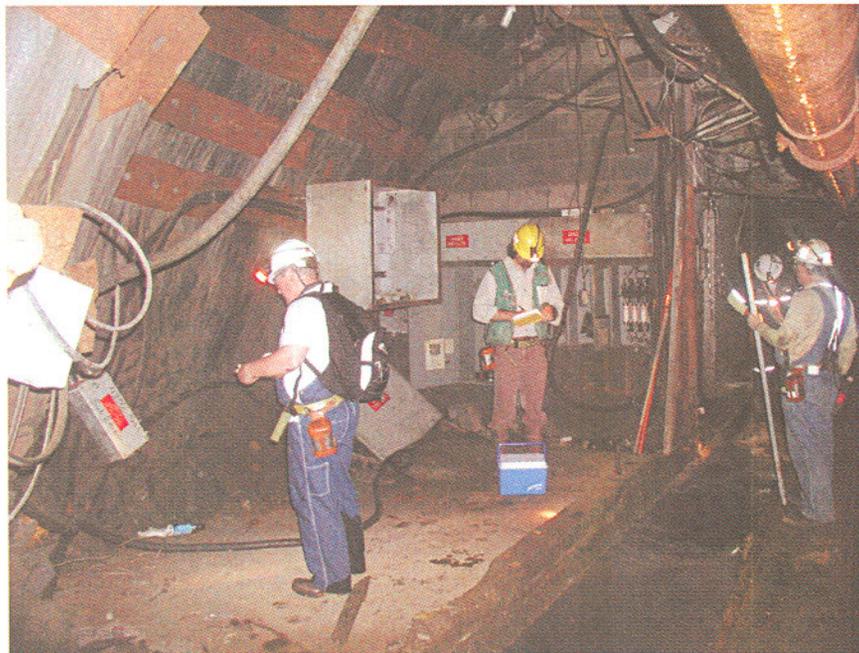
4850 Level, 45 crosscut electrical substation. All remaining equipment abandoned in place.
